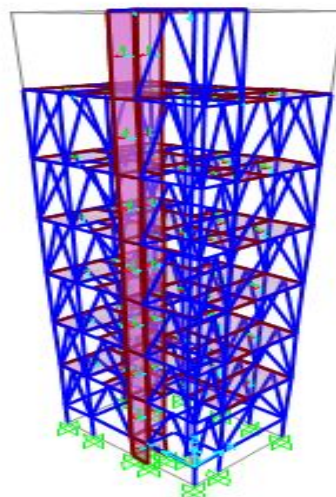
Building with X bracings of Section ISMB 100 provided at outer periphery
